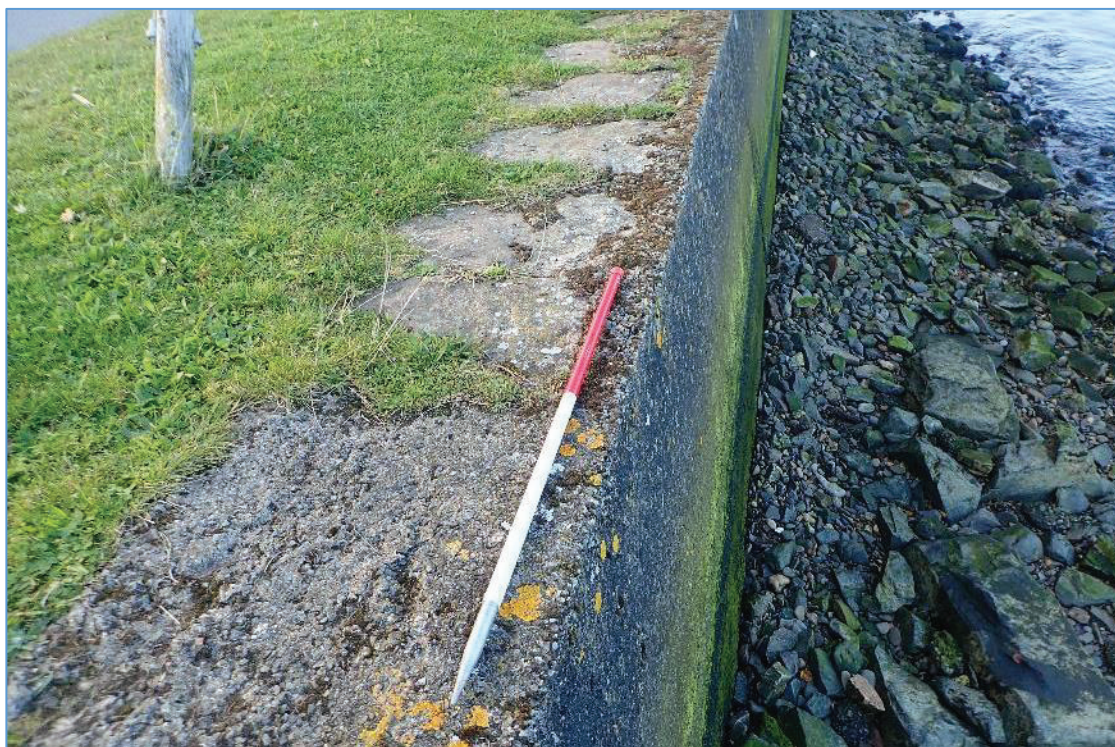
View of South Quay looking upstream showing where the original stone façade becomes masked by later concrete render.
